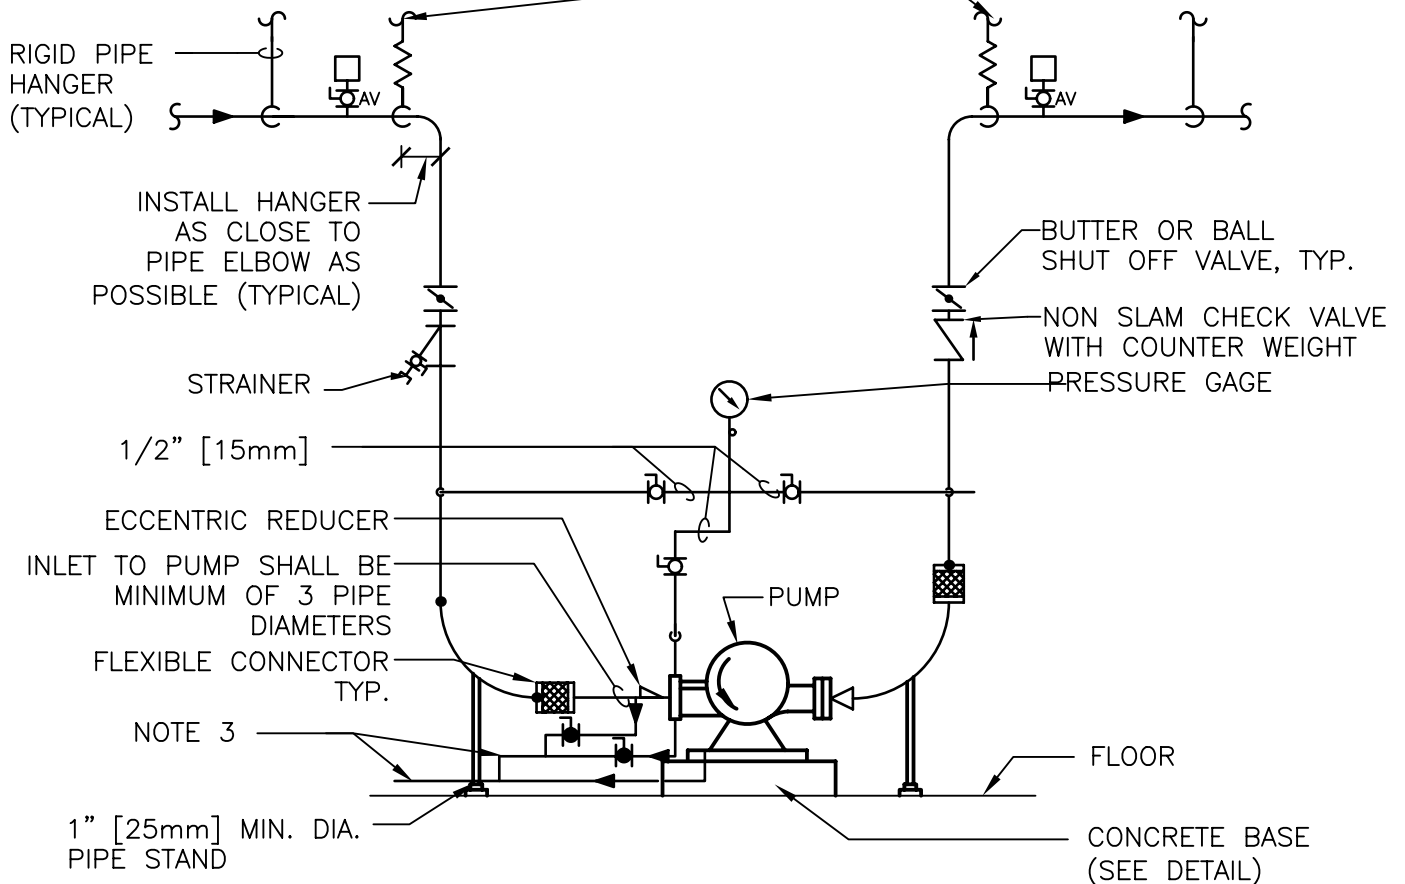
DETAIL TITLE / DOUBLE SUCTION FLOOR-MOUNTED PUMPS -
